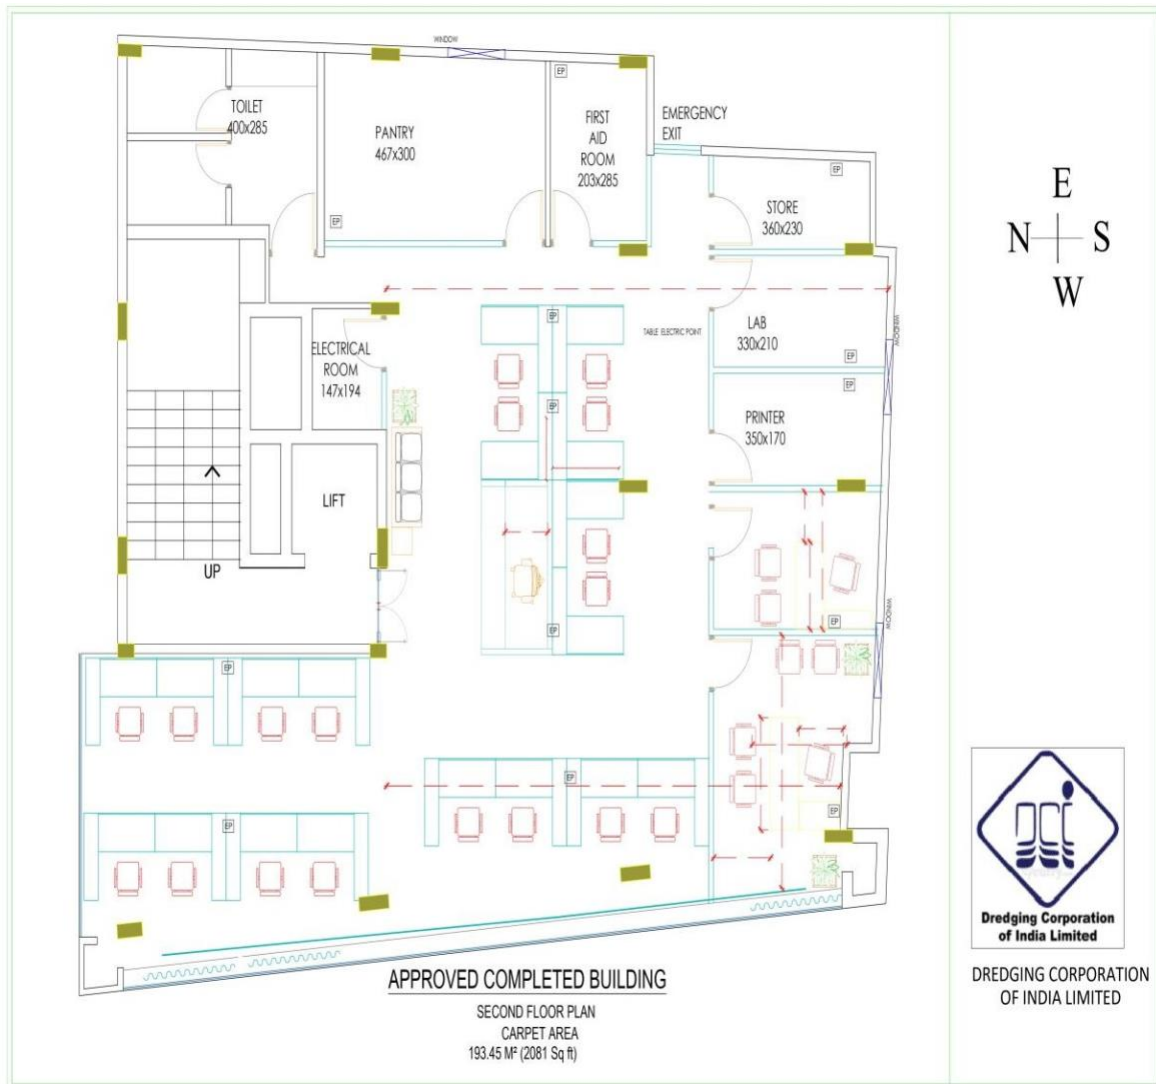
· SECOND FLOOR TYPICAL PLAN/LAYOUT
